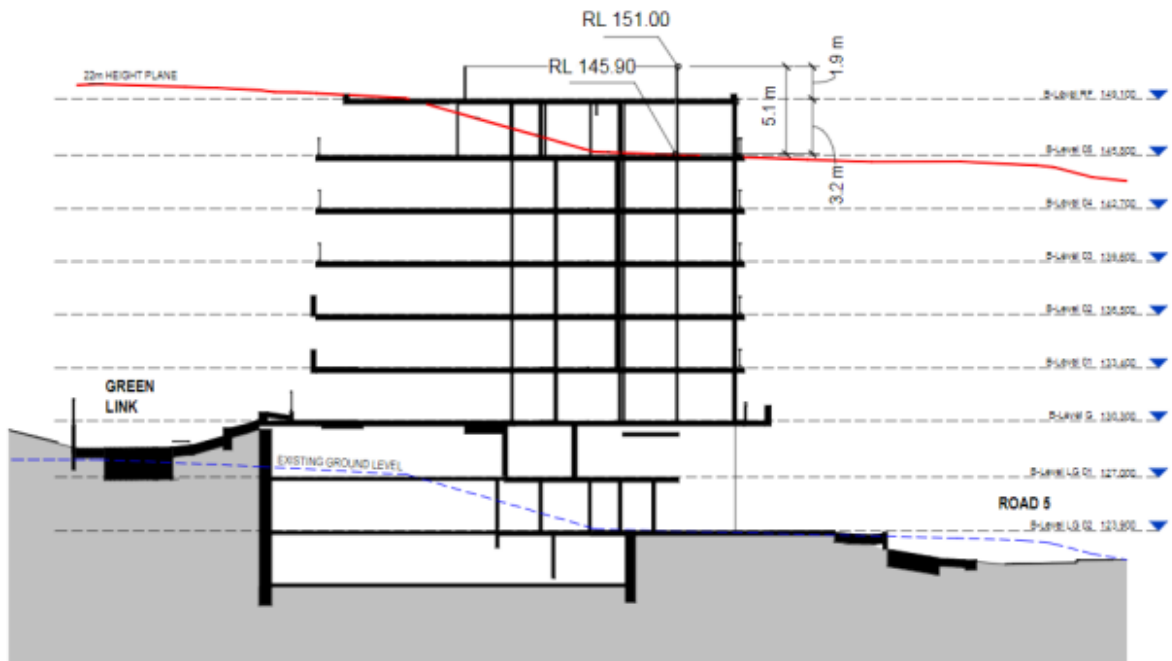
South Section of Building B showing the extent of height contravention (5.1m) (Source: Mirvac Design)
